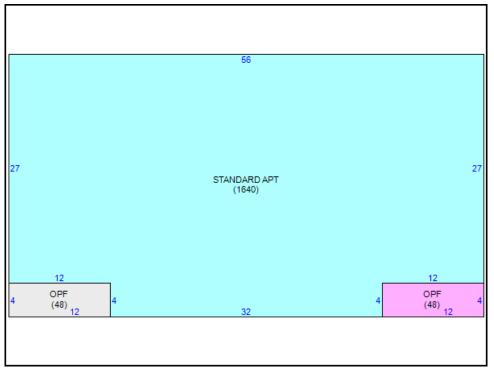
Standard duplex apartment plan (Leon County Property Appraiser 2020).
